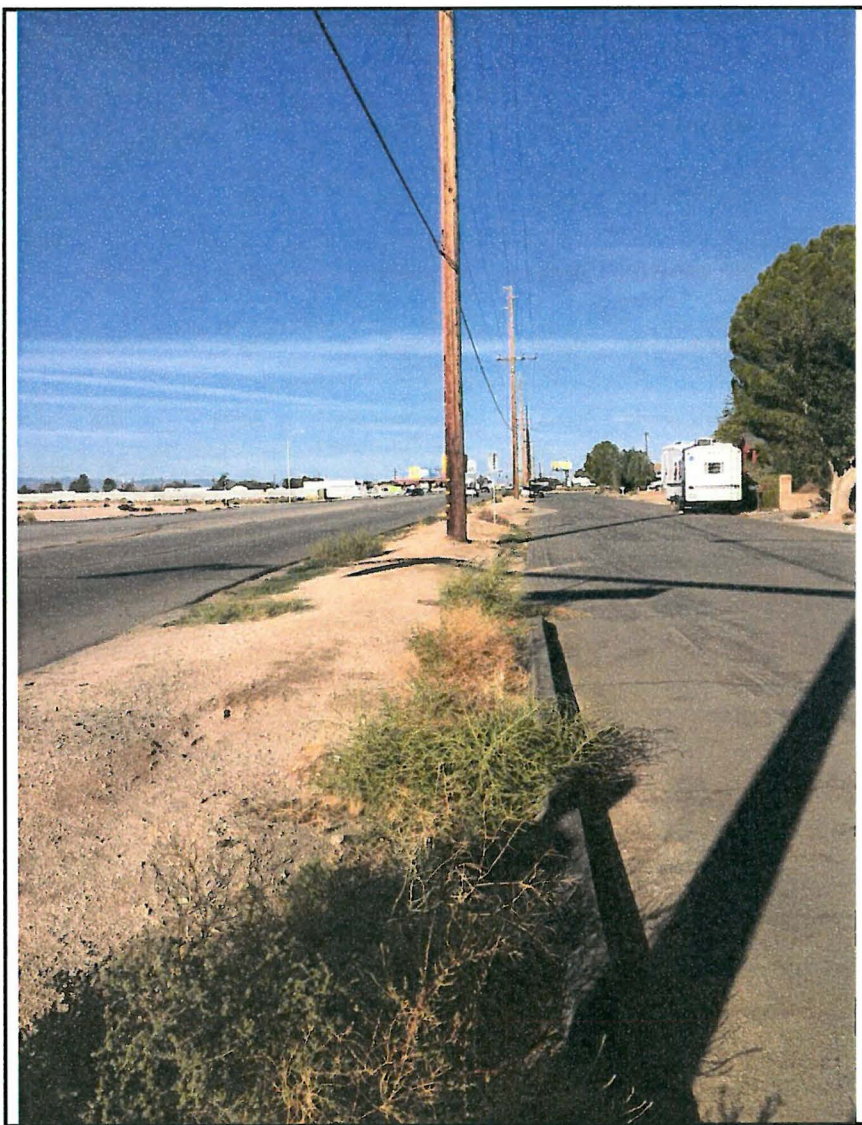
View facing west of disturbed area proposed for sidewalk construction.
